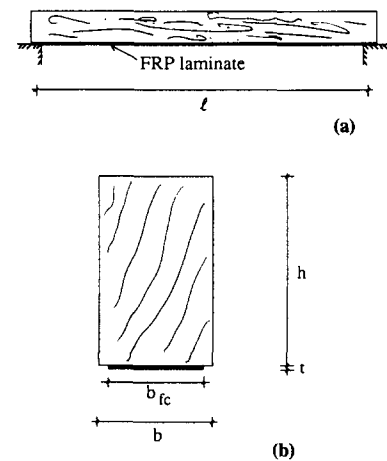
(a) Wood Beam Reinforced with FRP Laminate; (b) Its Cross Section
